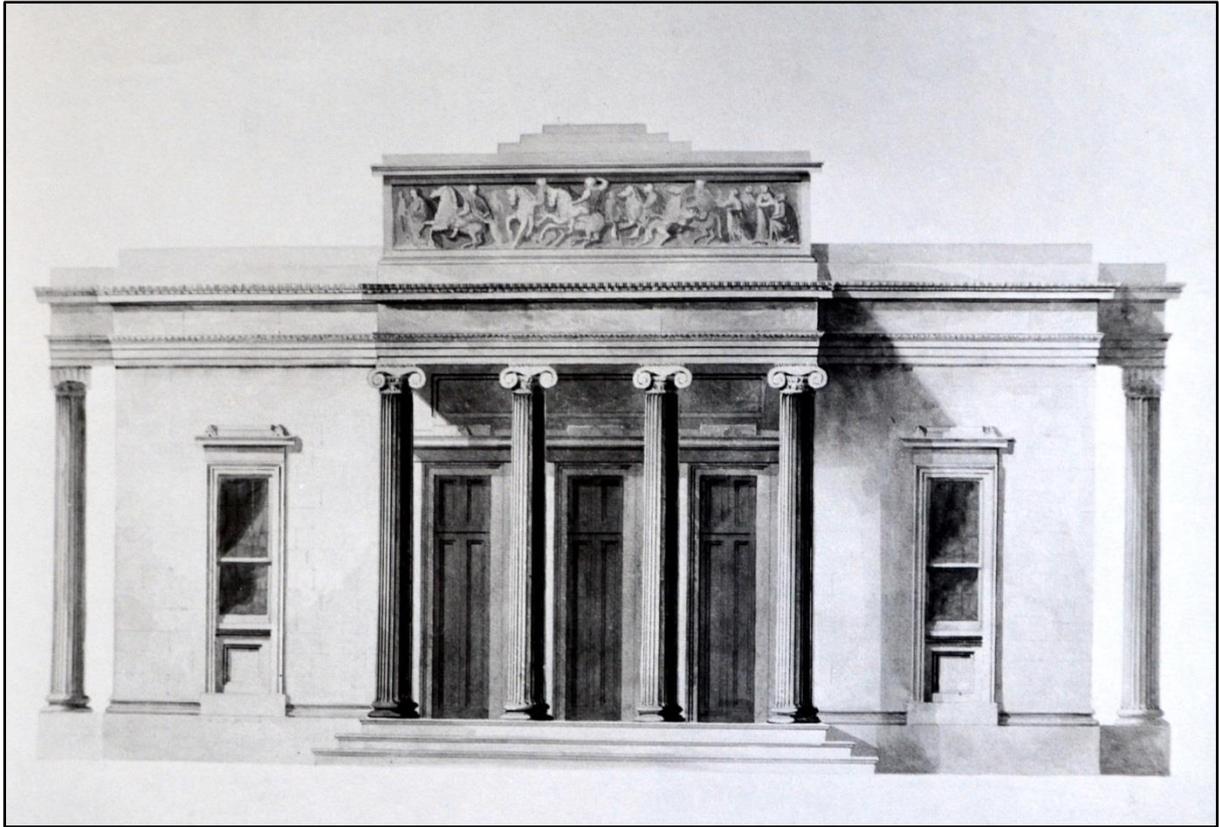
Design for a public building, front elevation, unexecuted. Henry Hill, probably 1830s. Though little more than a *capriccio* from the young architect this design was remarkably similar to his Limerick city plan in its columnar arrangement and composition and shows Hill's confidence in his own architectural skills. The figure of Justice is replaced by a rich sculpted attic panel. Reproduced courtesy of the Allen family.
